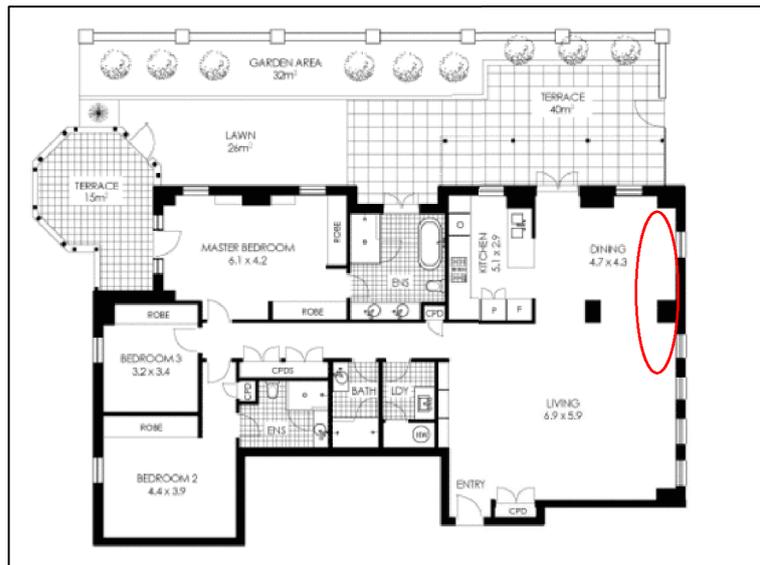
Location of affected windows of Unit 10 of No 1-3 Wallaringa outlined in red
